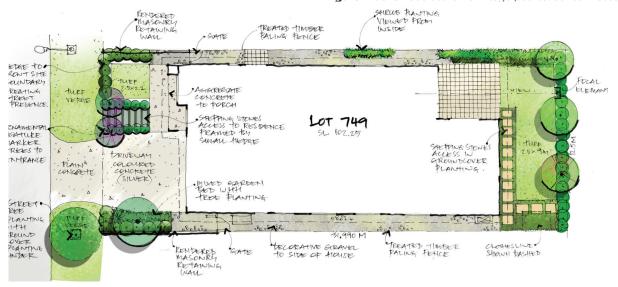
Landscape Plan at the Hermitage (source: Ground Ink Landscape Architects)
